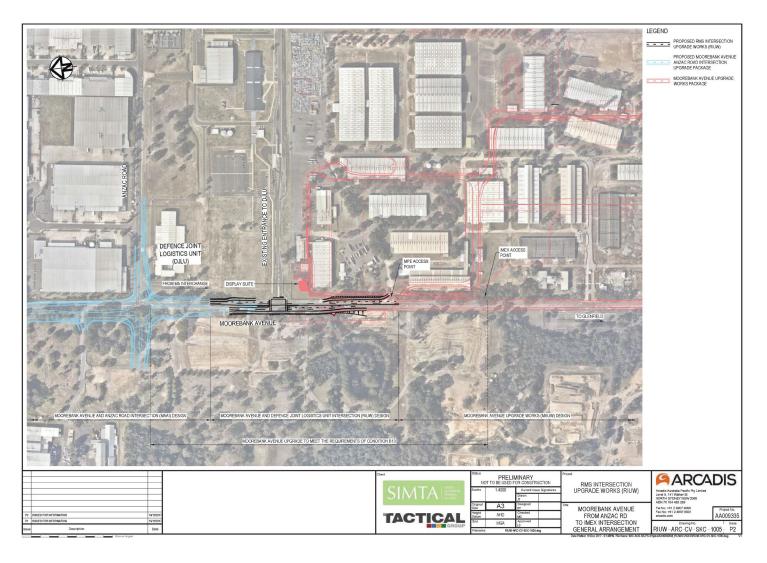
Indicative Layout Plan - Moorebank Avenue/ Anzac Road Intersection Upgrade
